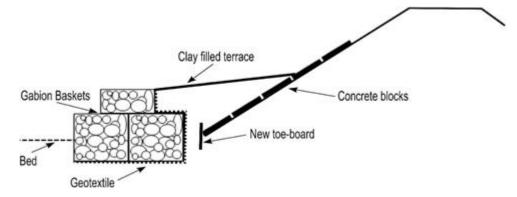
Schematic cross Section of new terraces, backfilled with clay behind stone filled gabions to protect the toe of the sea wall (Source: Cousins, 2017).
